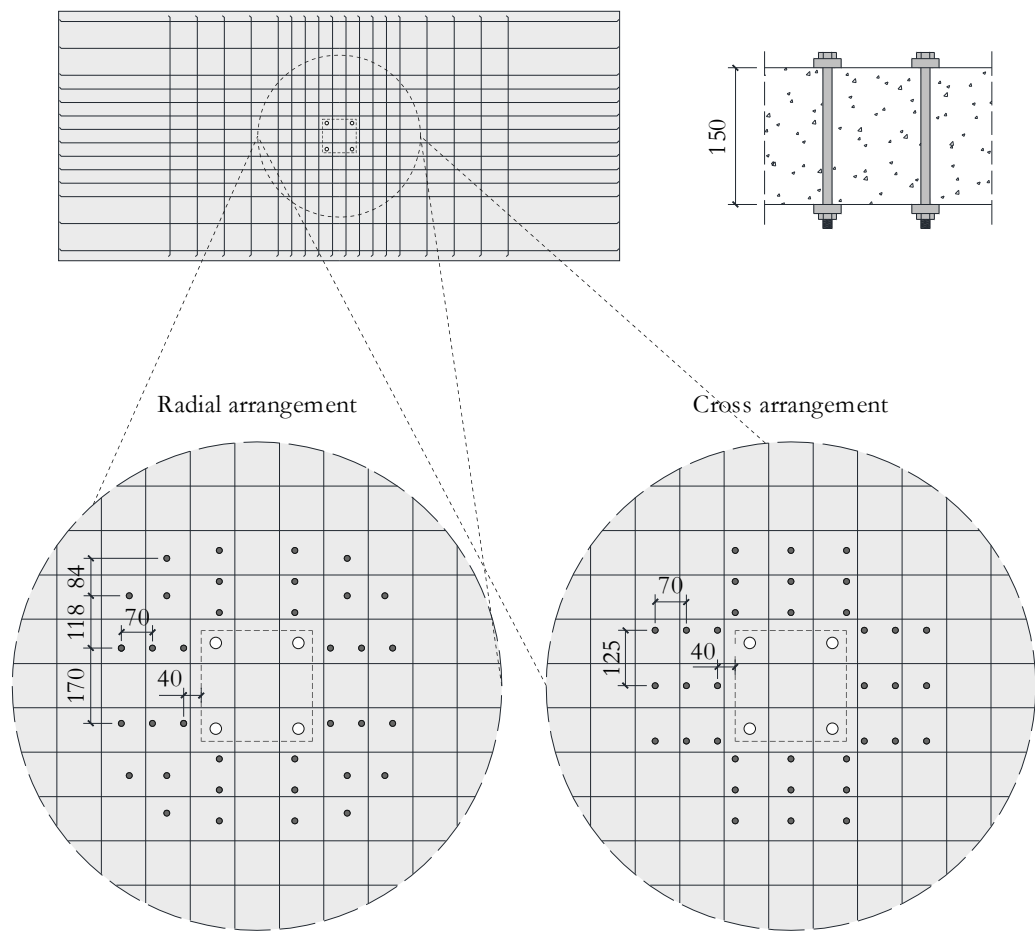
Arrangement and details of the post installed shear bolts. Dimensions in millimetres.
